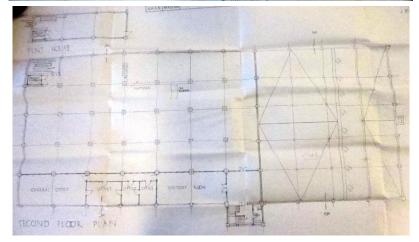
and 15: Ground and first floor plan of the original factory building. Figure 16: Second floor plan of the original factory building.
